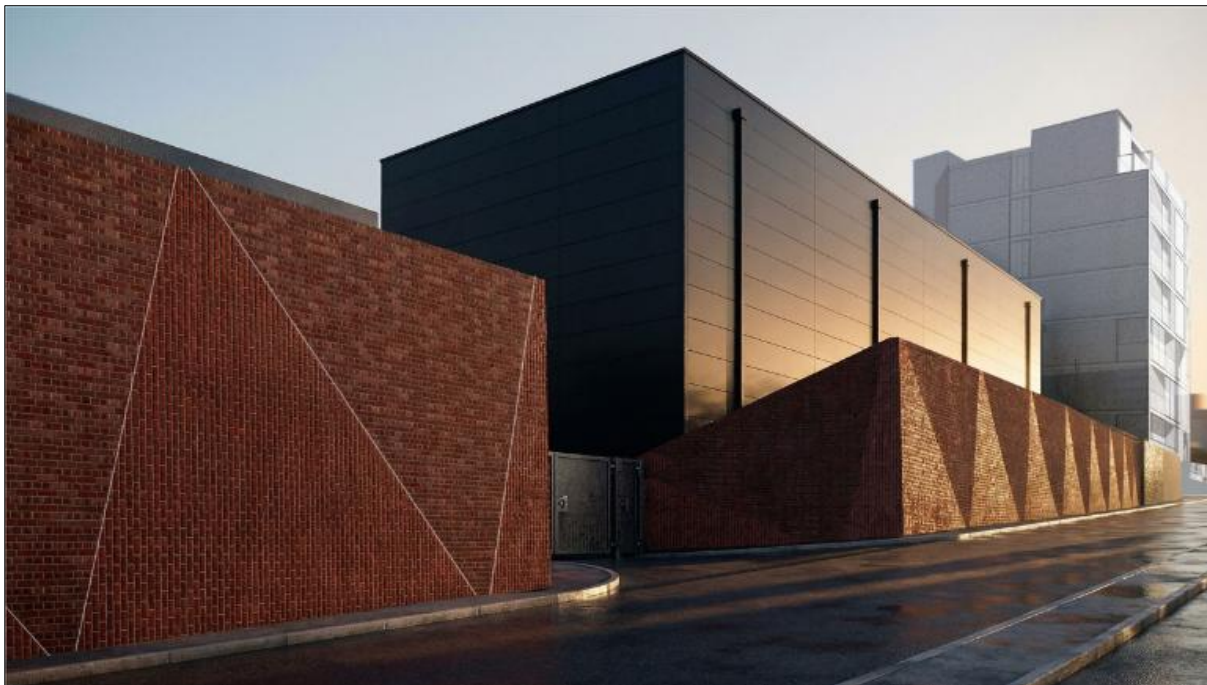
Proposed Substation Building Concept Design (Source: Ryan&Lamb Architects)
